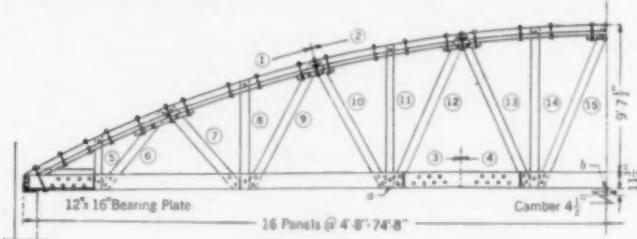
WOODEN BOWSTRING TRUSS, 75-Ft. SPAN
